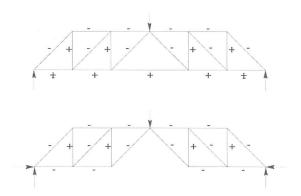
Truss models for a beam with passive reinforcement (top) and for a beam prestressed by unbonded tendons (bottom) (Walraven, 2011).
